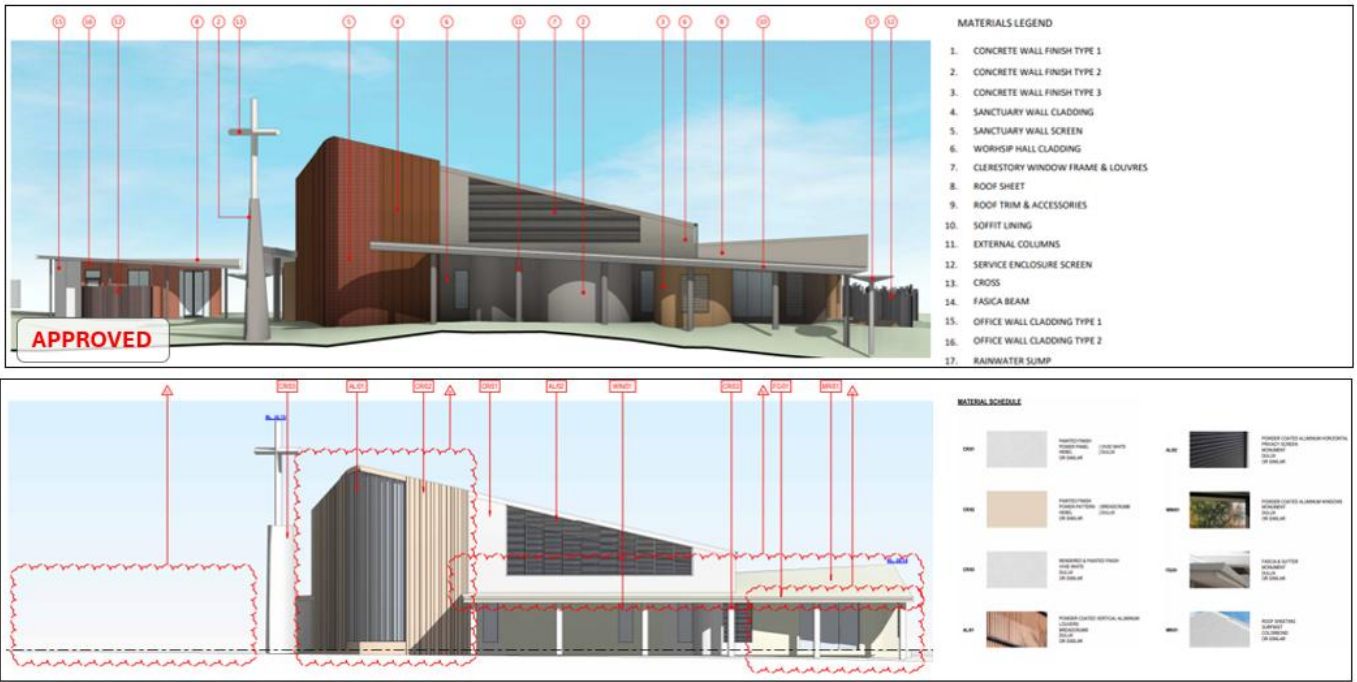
| Approved vs Proposes material schedule (north elevation) (Source: SSD-10383 Stamped plans and Applicant’s RtS, 2026)
